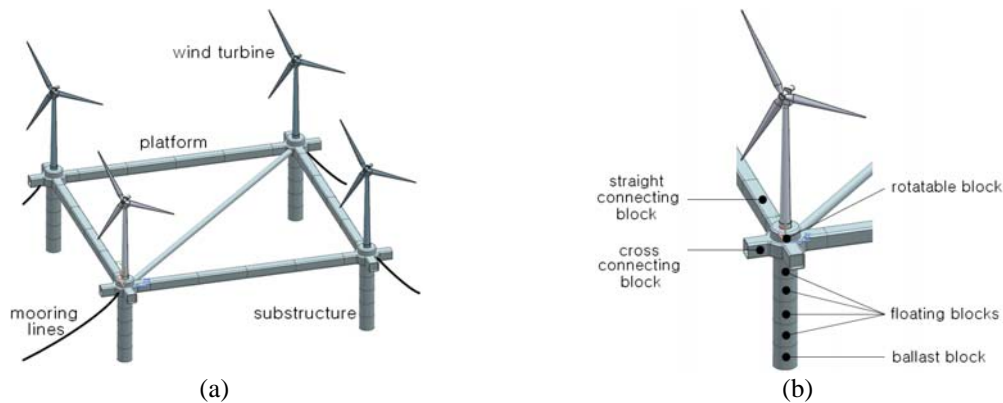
(a) A base multi-platform composed of four wind turbines, (b) block-type assembling
